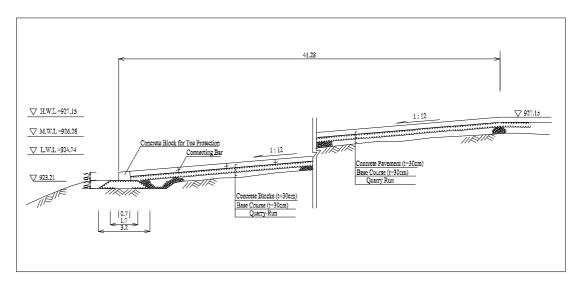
Typical Cross Section of Onshore Ramp
